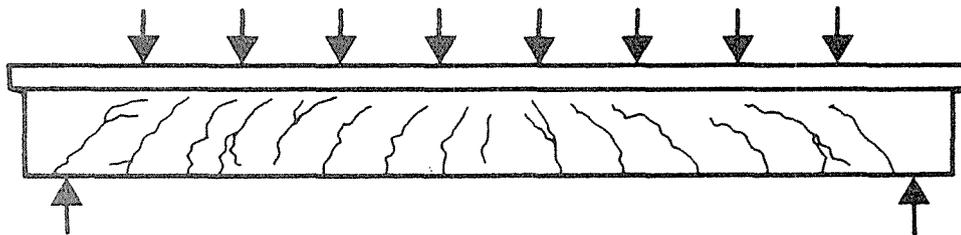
Classical mode of failure of reinforced or prestressed concrete beam or one-way slab.
